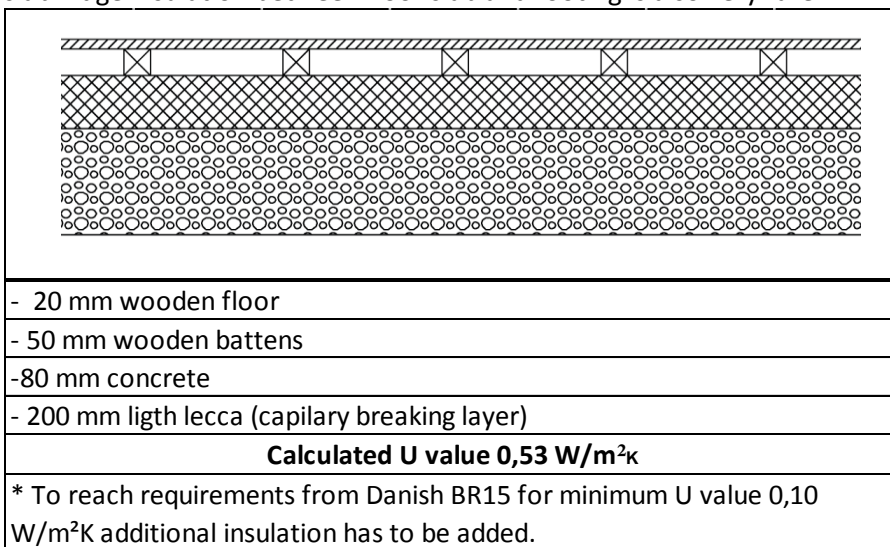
Floor without insulation between wooden battens in 1960-1976.
